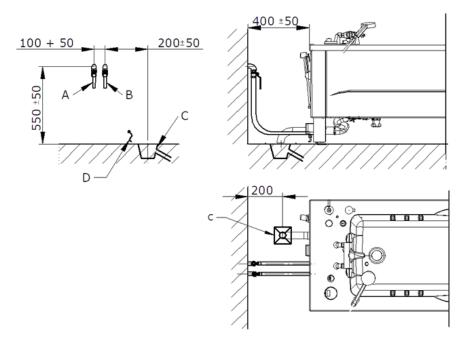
Bathaid bathtub side drain media outlet layout (dimensions in mm)
